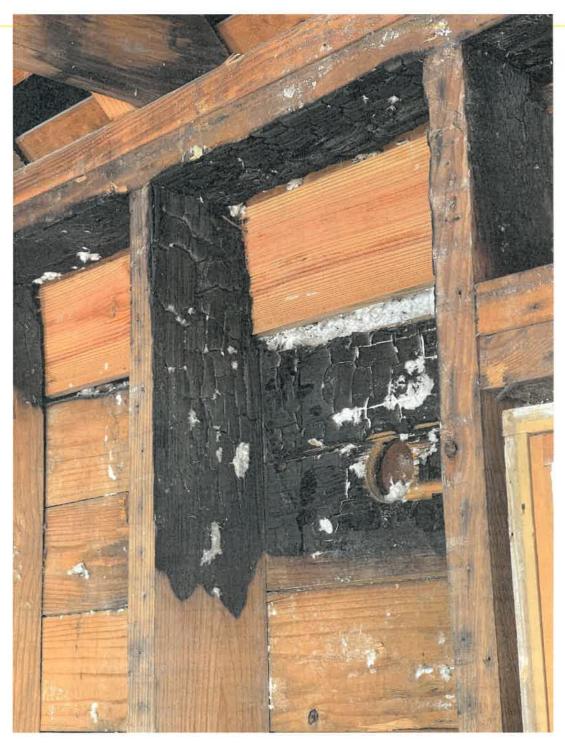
North Wing (Second Floor) –Wood framing at east wall. Charred remains indicate evidence of prior fire
